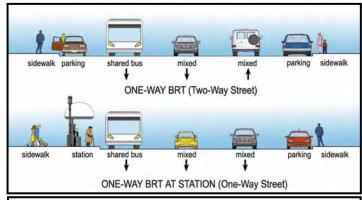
Roadway Cross Section with Shared BRT Lane, Side Running
